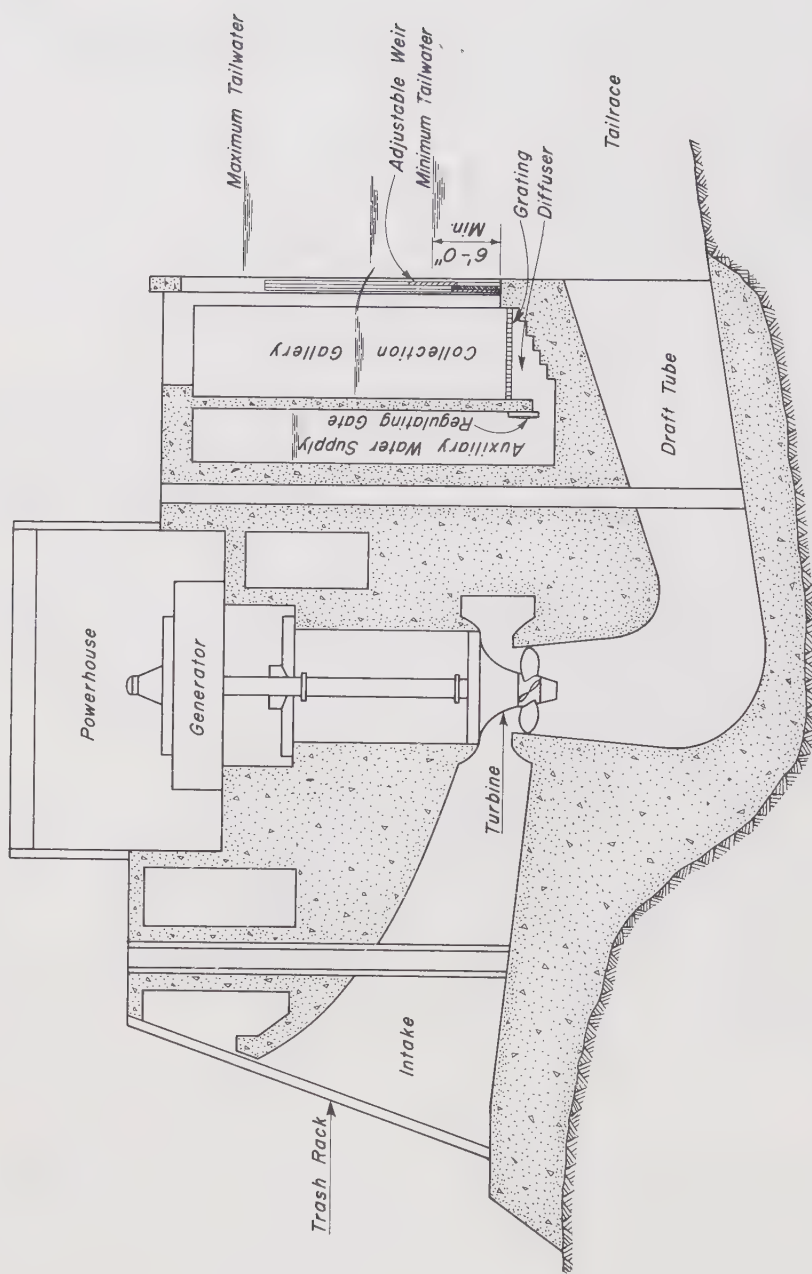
Cross section through a power-house showing a typical arrangement of a fish-collecting system.
